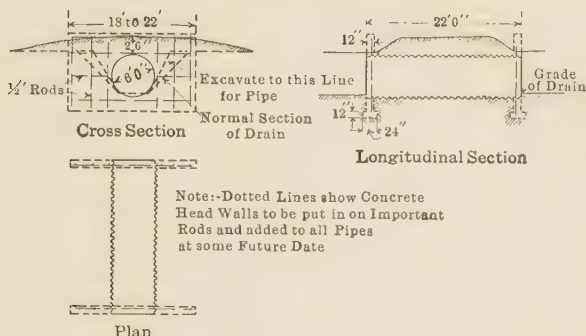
Corrugated-iron culvert on deep drain for road crossing. Sacramento Valley Irrigation Co., Calif.
